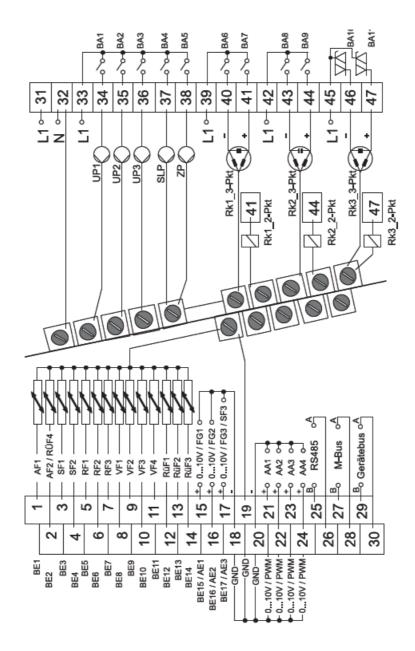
Connection of SAUTER EQJW246F003 Controller with standard base
